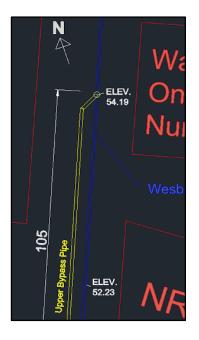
AUTOCAD rendering of upper bypass junction (yellow) with existing storm drain (blue)
